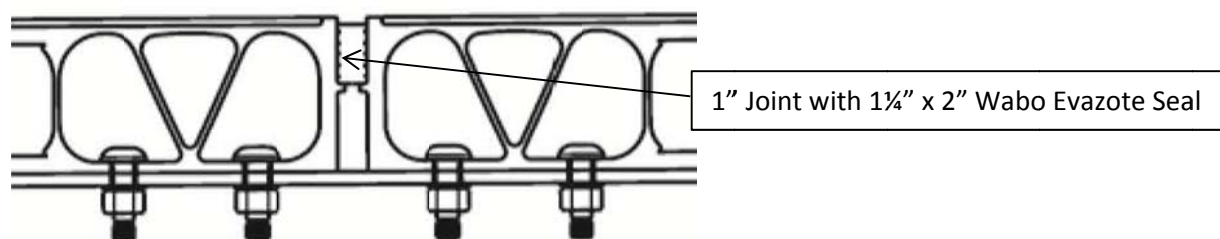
Typical Bascule Bridge Partial Longitudinal Section at End Floorbeam
